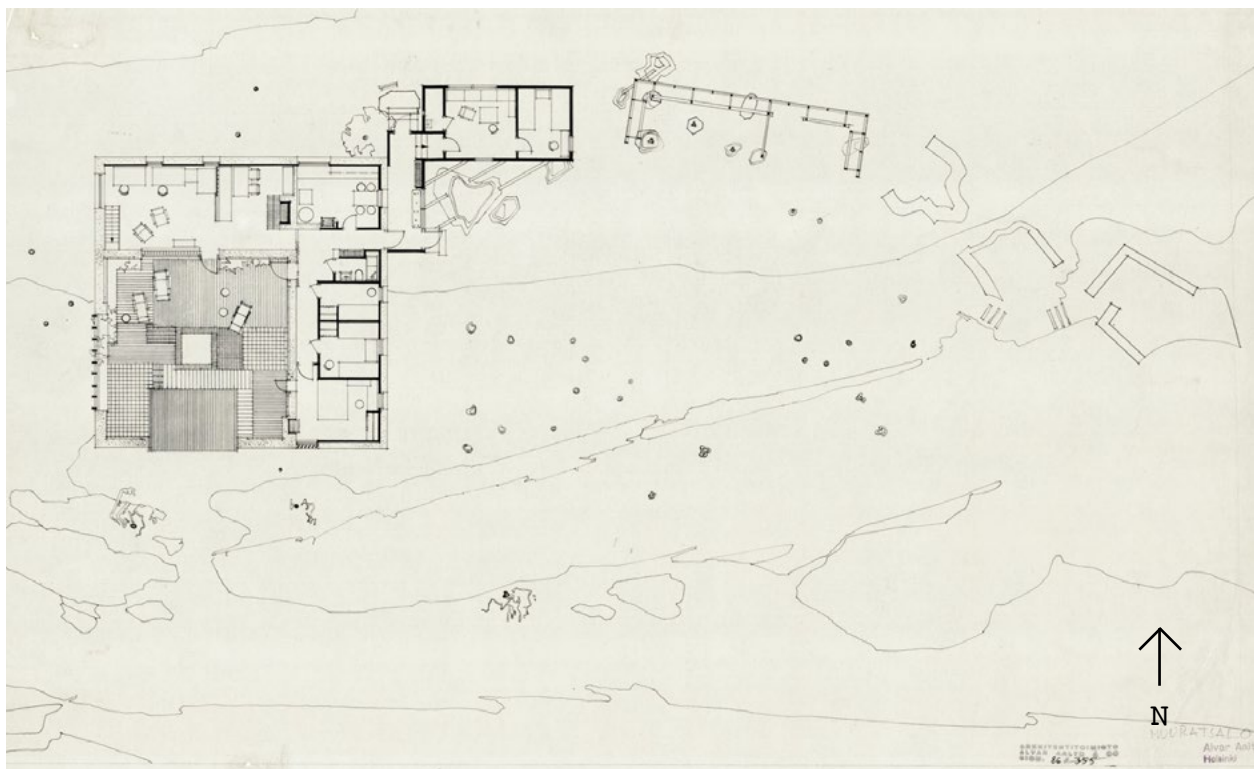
Alvar Aalto, site plan, Experimental House, Muuratsalo, Finland, 1952
